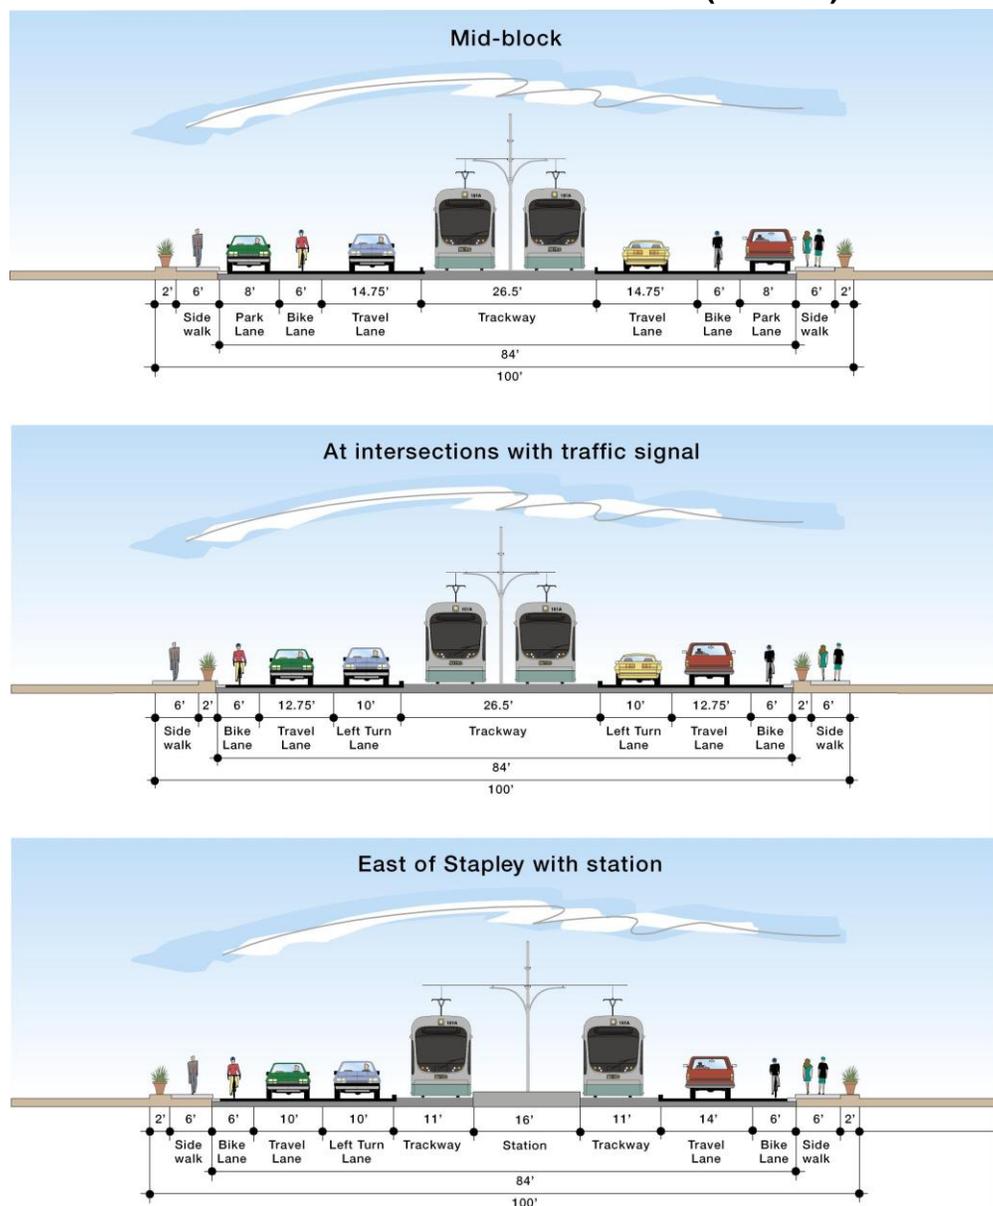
BUILD ALTERNATIVE (4-LANE)
